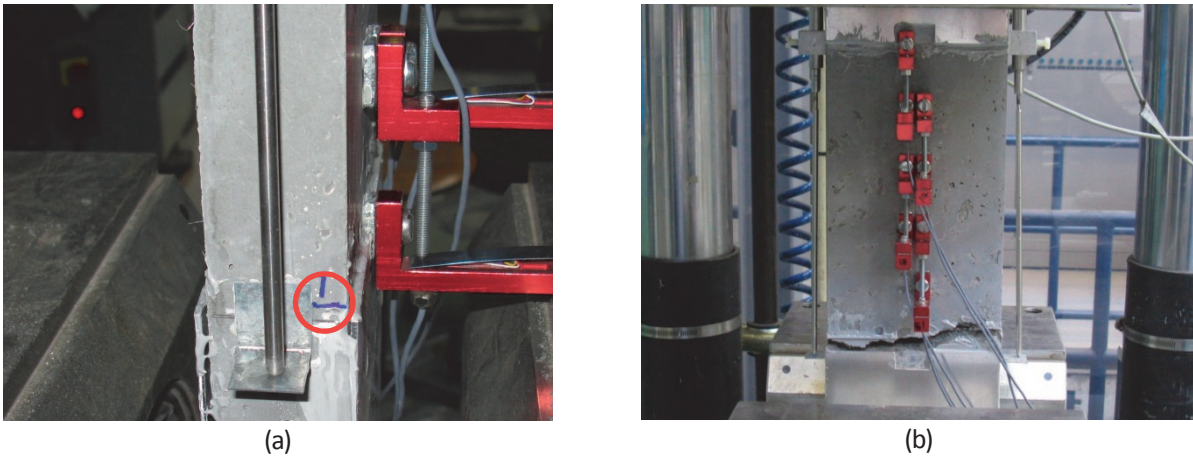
(a) Macrocrack opening observed during S1-1_ii test and (b) fractured S1-1 test specimen
